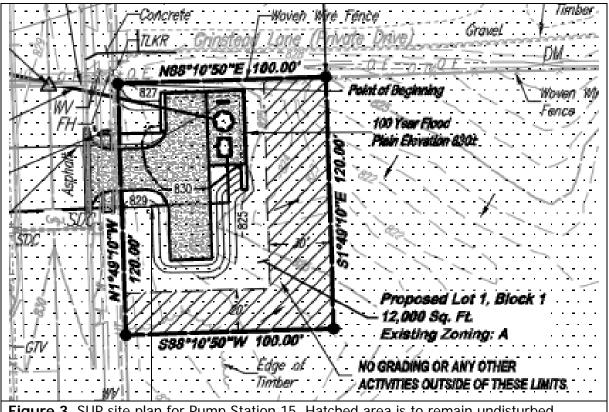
SUP site plan for Pump Station 15. Hatched area is to remain undisturbed.
